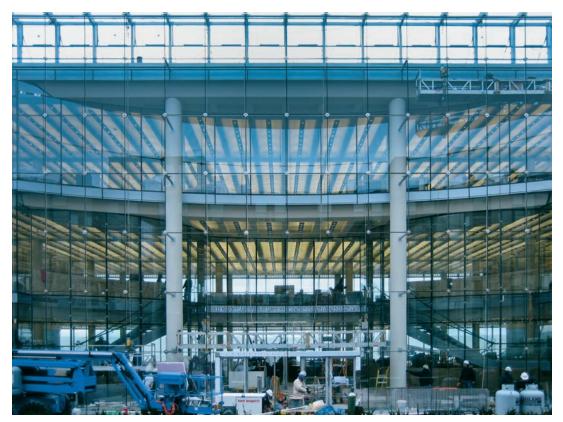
The entry of the west facade during construction. Note the view to Lake Michigan beyond.
